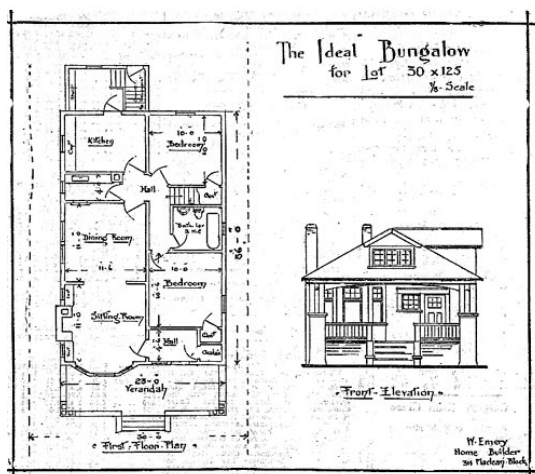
Plan and elevation of a typical bungalow in Calgary, Alberta. c. 1912
